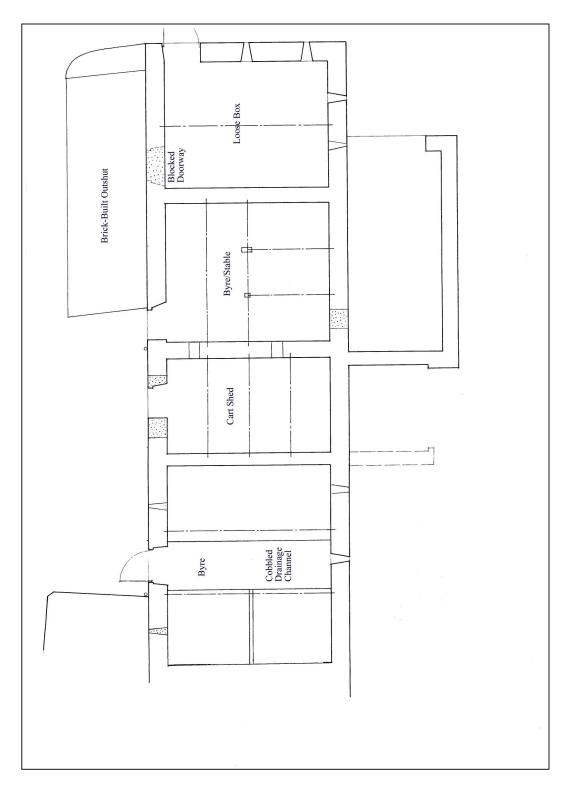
Plan of Lower Level of Bank Barn. Scale: 1:100
